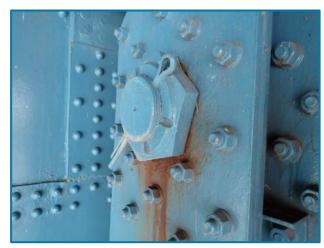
Minor rust bleed and abrasion dust at upper east pin at the north leg of Tower C (looking northwest).
